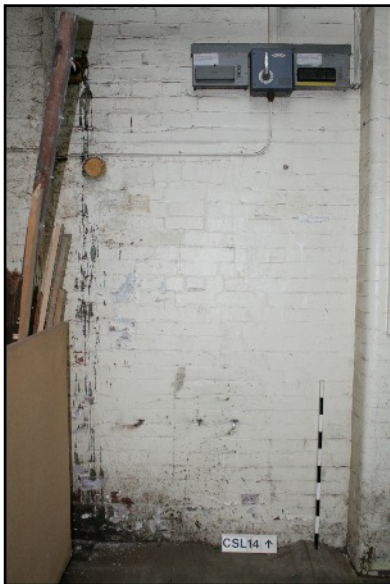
Infilled opening in the north wall of the original factory, (Phase A) viewed looking north.
